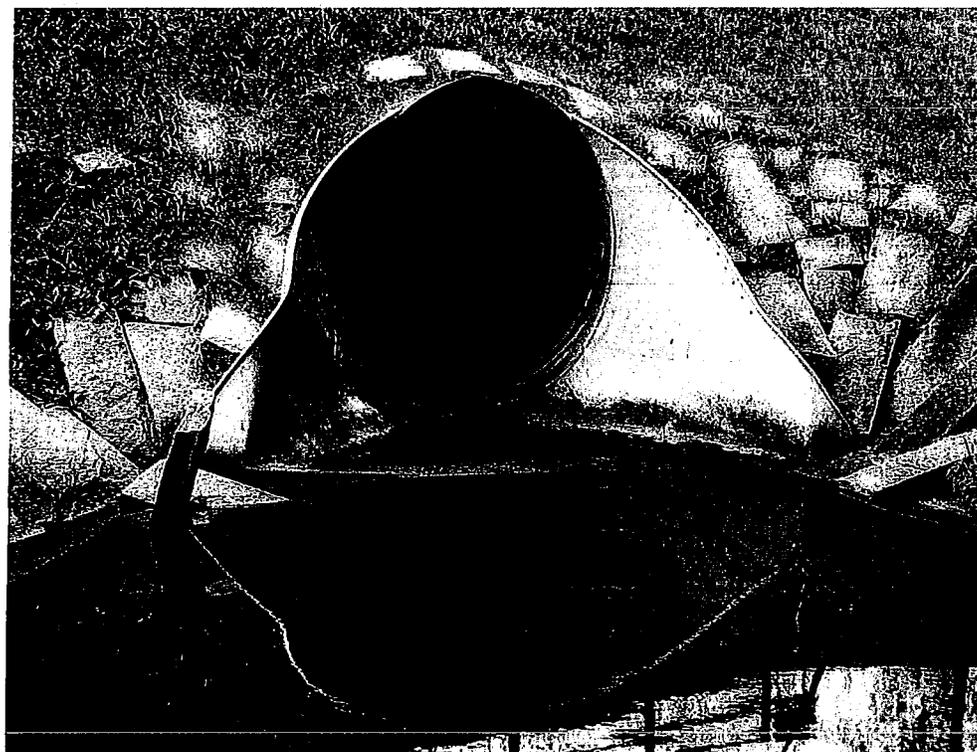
Spillway outlet flare, note gap between pipe invert and flare.
